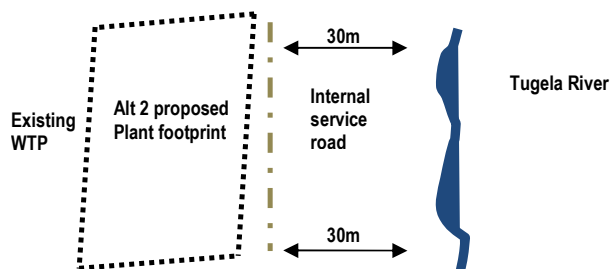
Alternative 2 layout proposal for new Water Treatment Plant
